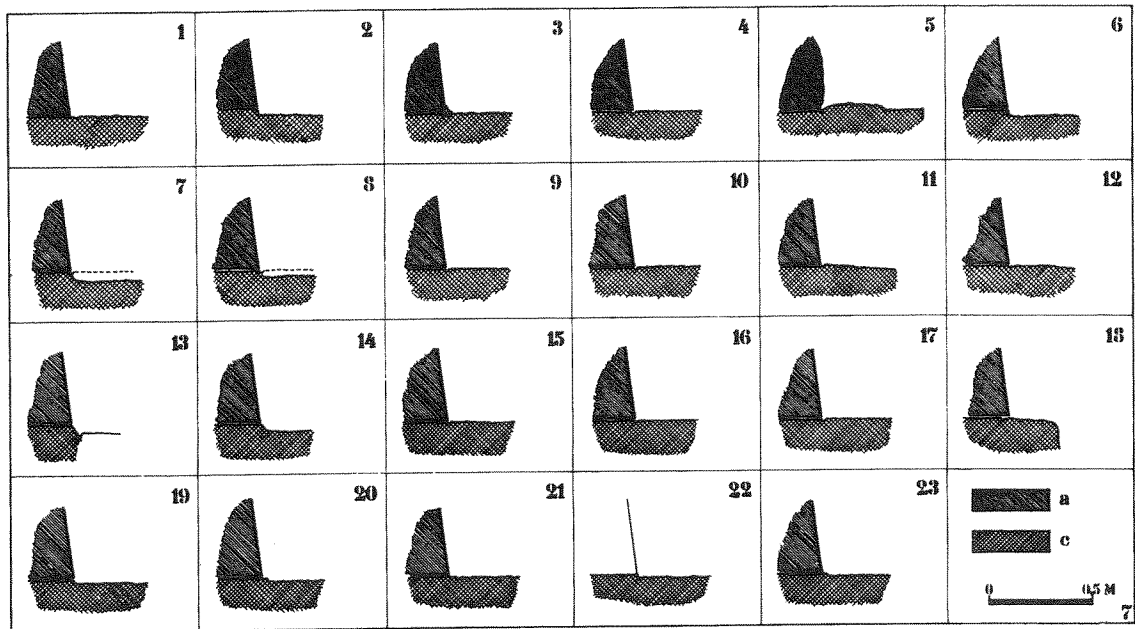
A comparison list of wall joints with the foundation longitudinal incisions.
